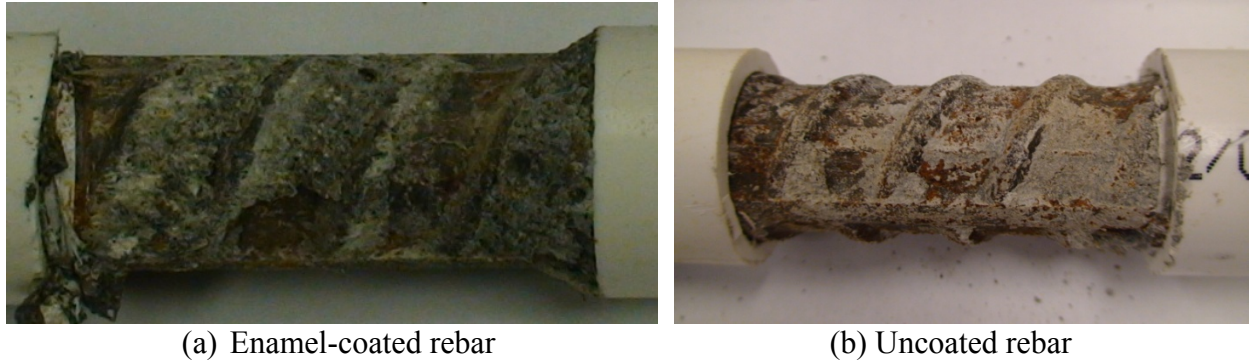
Details of concrete-rebar interfaces (#8 rebar).
